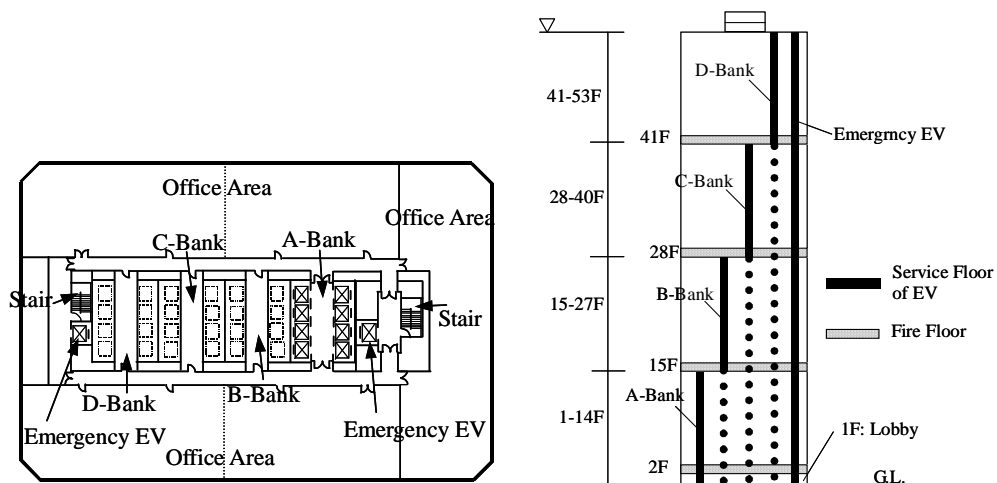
Floor plan and elevation of a model high-rise building for case study.
